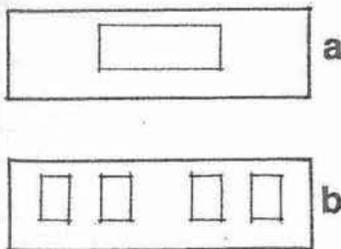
Elevation of a 10 x 3 m wall, with 10 m<sup>2</sup> window
